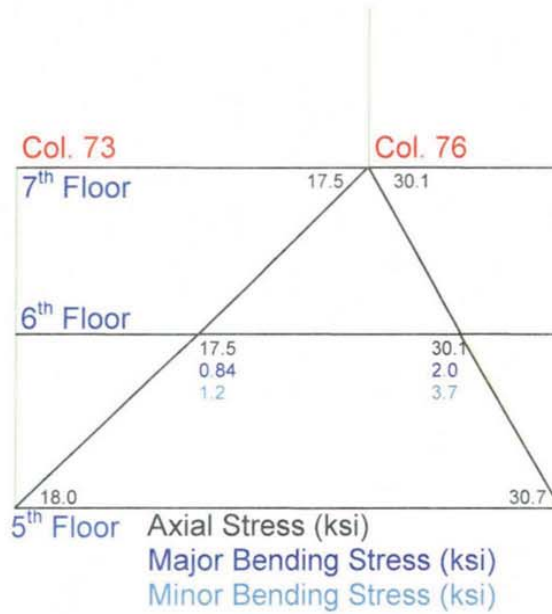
Stresses in Truss 1 diagonals taking the diagonals as having fixed connections at the top and bottom.
